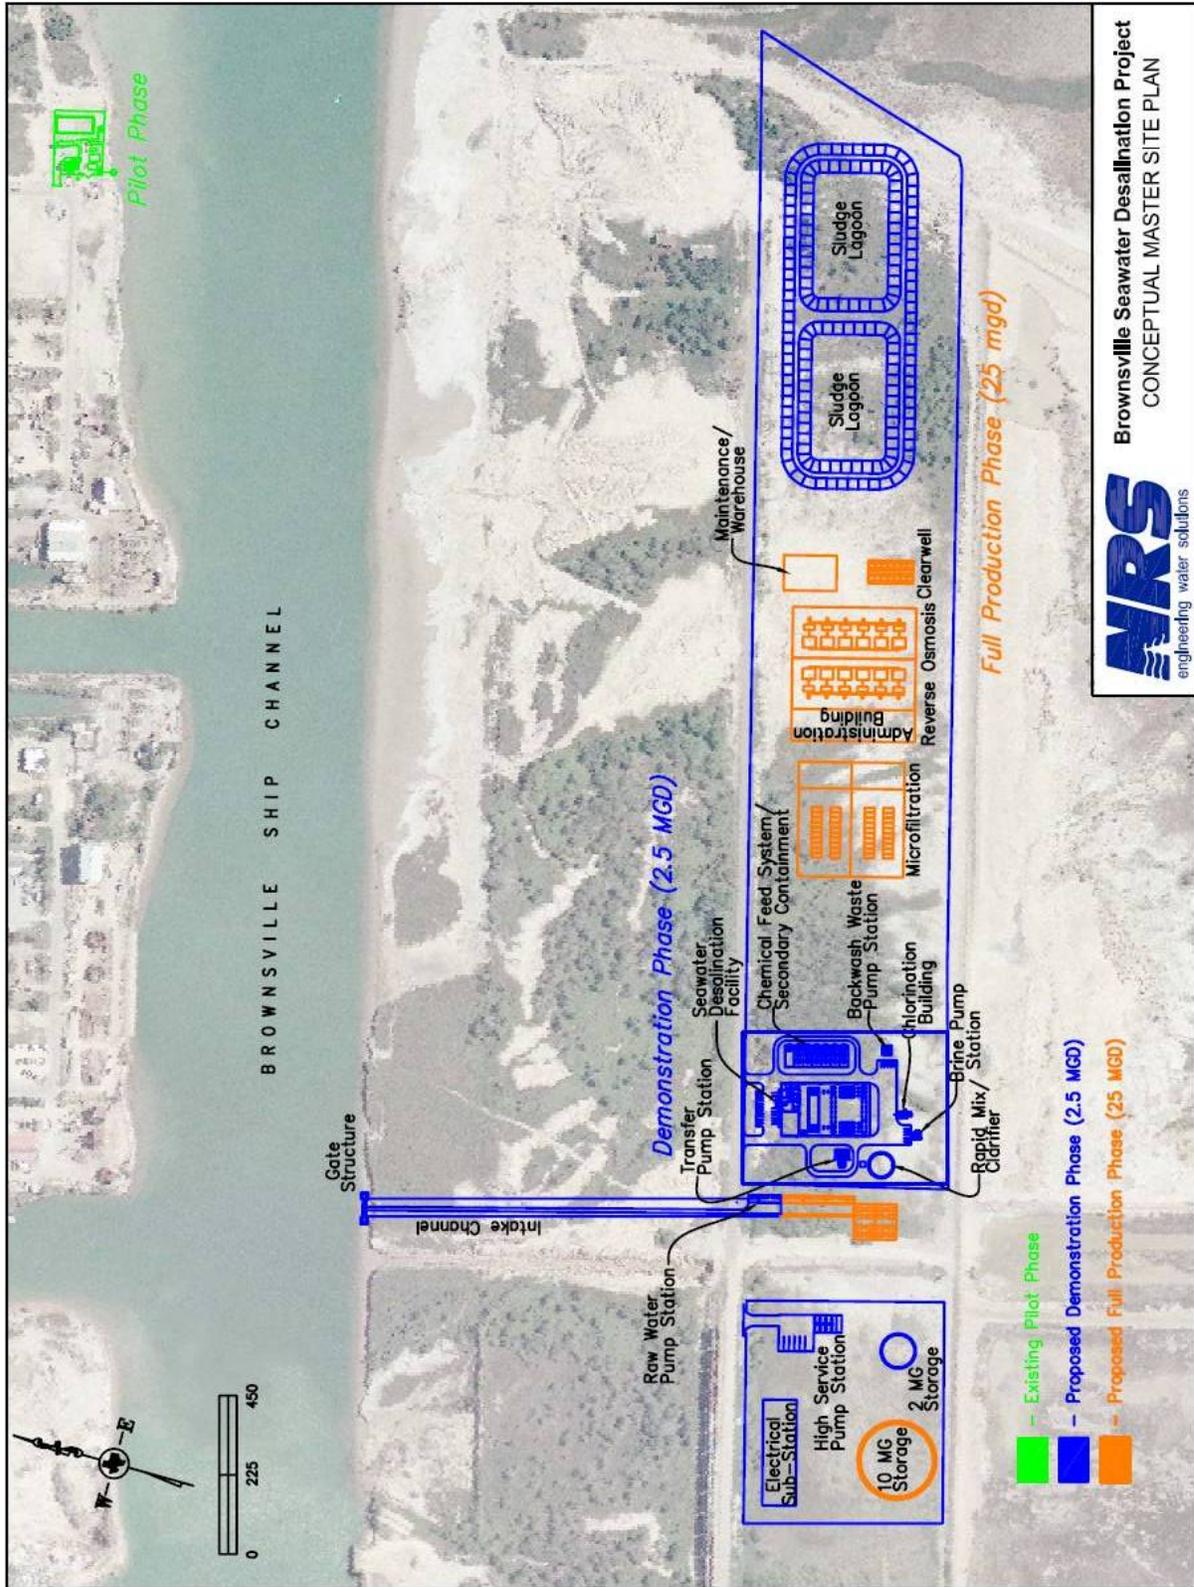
Conceptual site layout for the proposed 2.5 mgd Demonstration Project.
